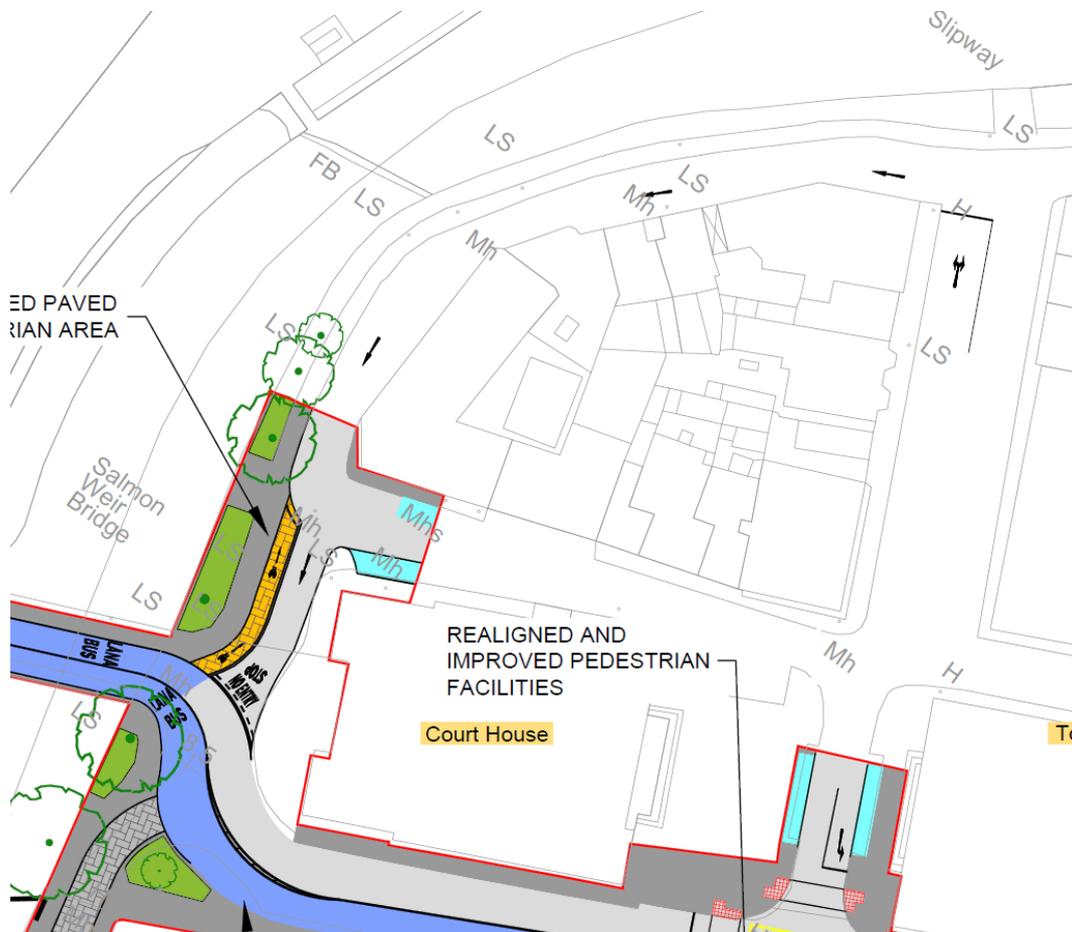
Extract from Proposed General Arrangement at Galway Courthouse
